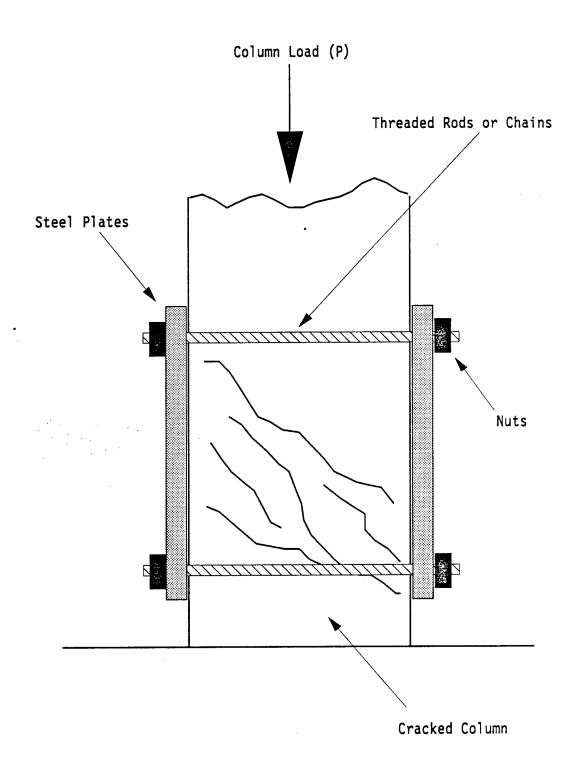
Splinting a Cracked Reinforced Concrete Column.
